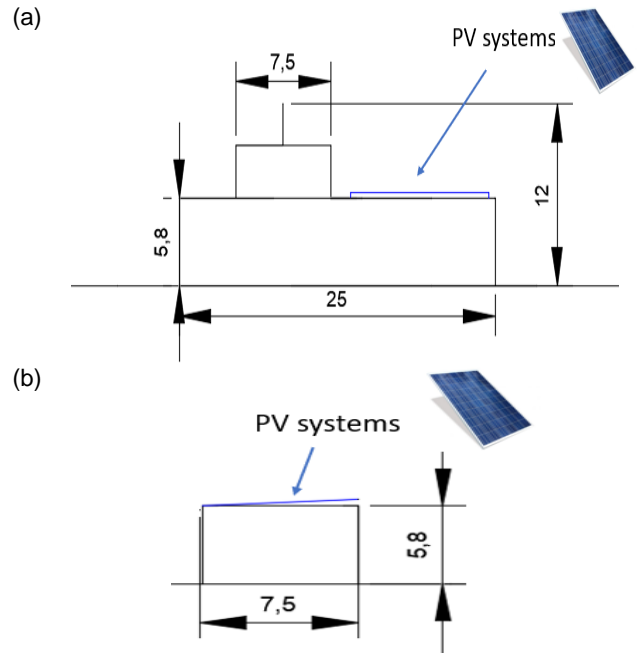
Plant dimensions in meters: (a) side view, (b) front view.
